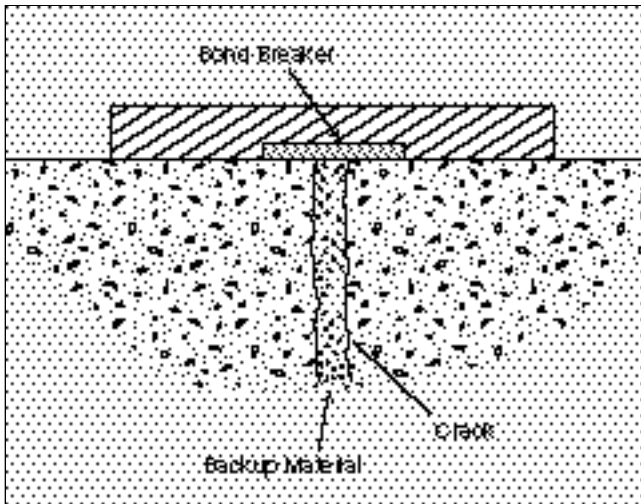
Flexible surface sealant can be used over narrow cracks subject to movement, if appearance is not a consideration. Note bond breaker over the crack itself.
